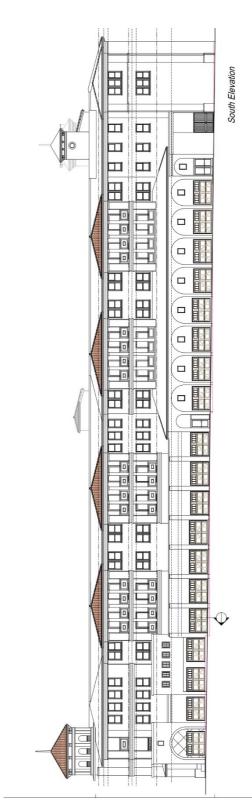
EXHIBIT D: ELEVATIONS / FLOOR PLAN / SECTIONS
